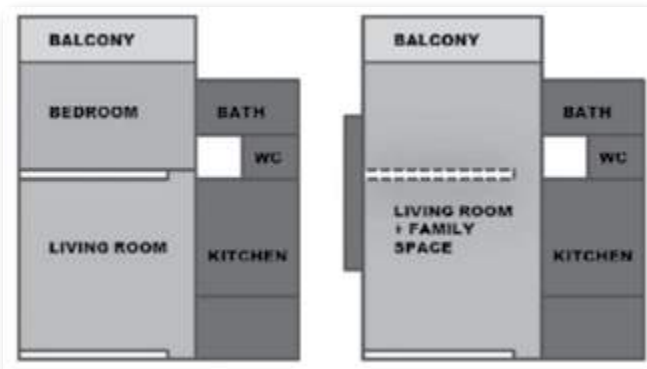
(i) and (ii): Planning of Undefined Neutral Space (Source: Author)
